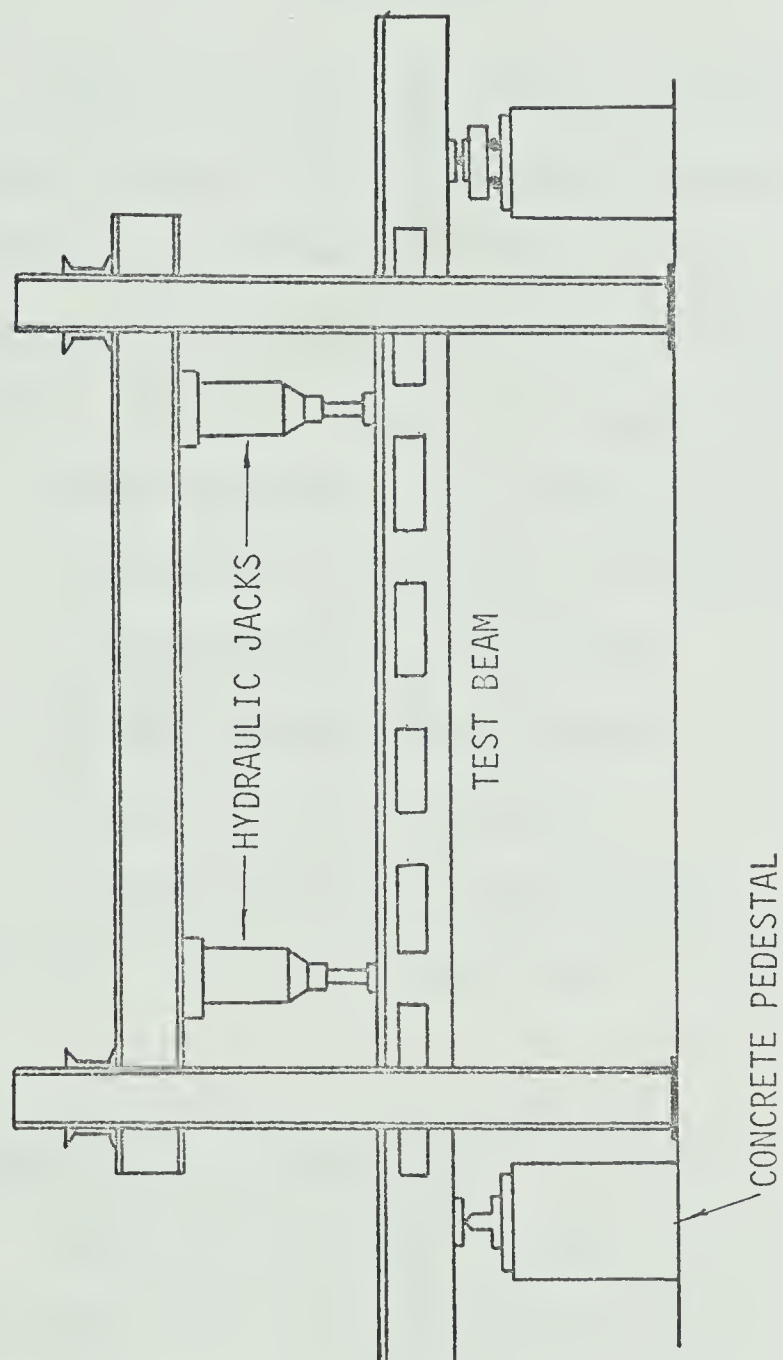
LOADING FRAME AND TEST SET-UP
